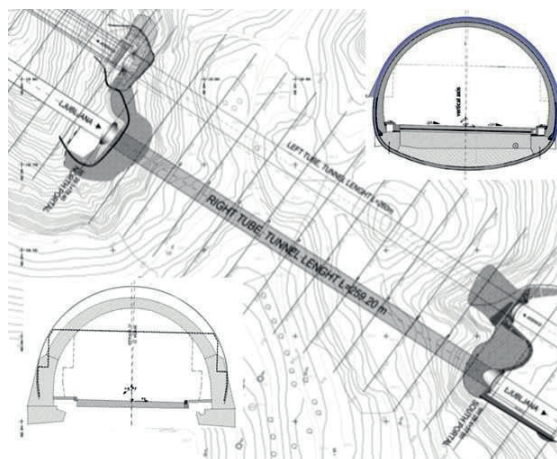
Location of the new and old tunnel tube with maximum overburden of about 30 m and clearance profiles of the old tunnel before reconstruction and after it.
